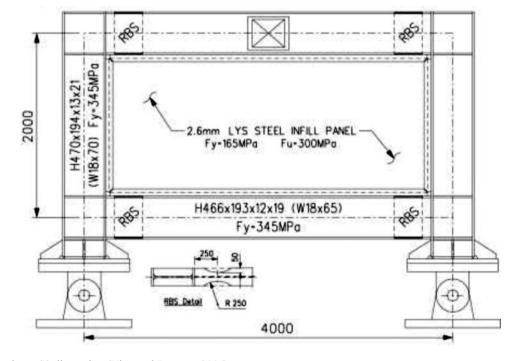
Specimen S2 dimension (Vian and Bruneau 2006).
